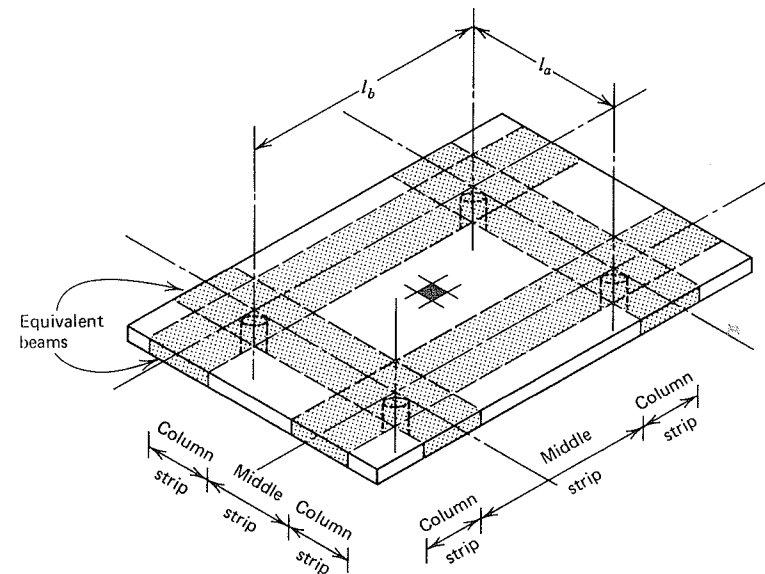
Two-way flat plate floor system showing equivalent beams.
